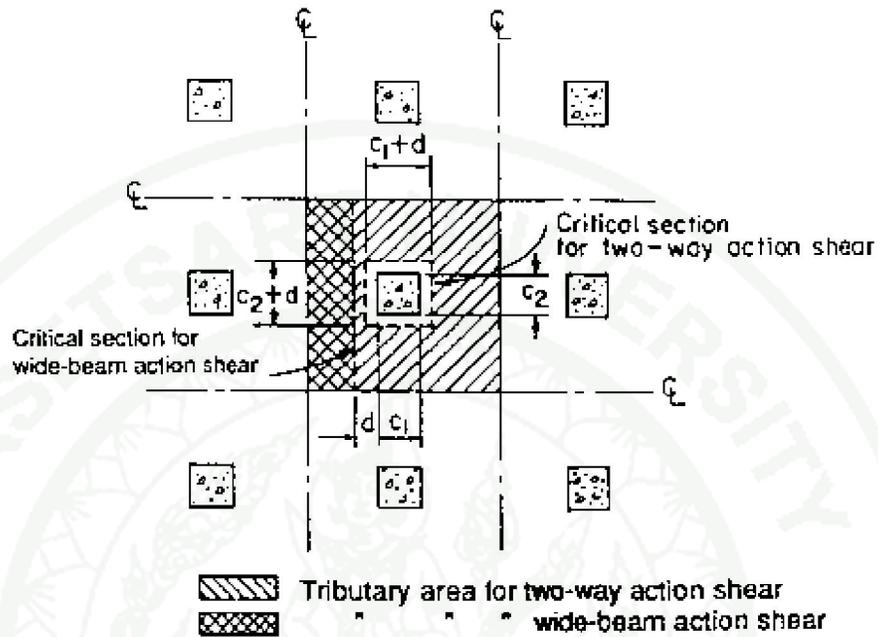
Tributary areas and critical sections for slab shear at a slab-column connection
